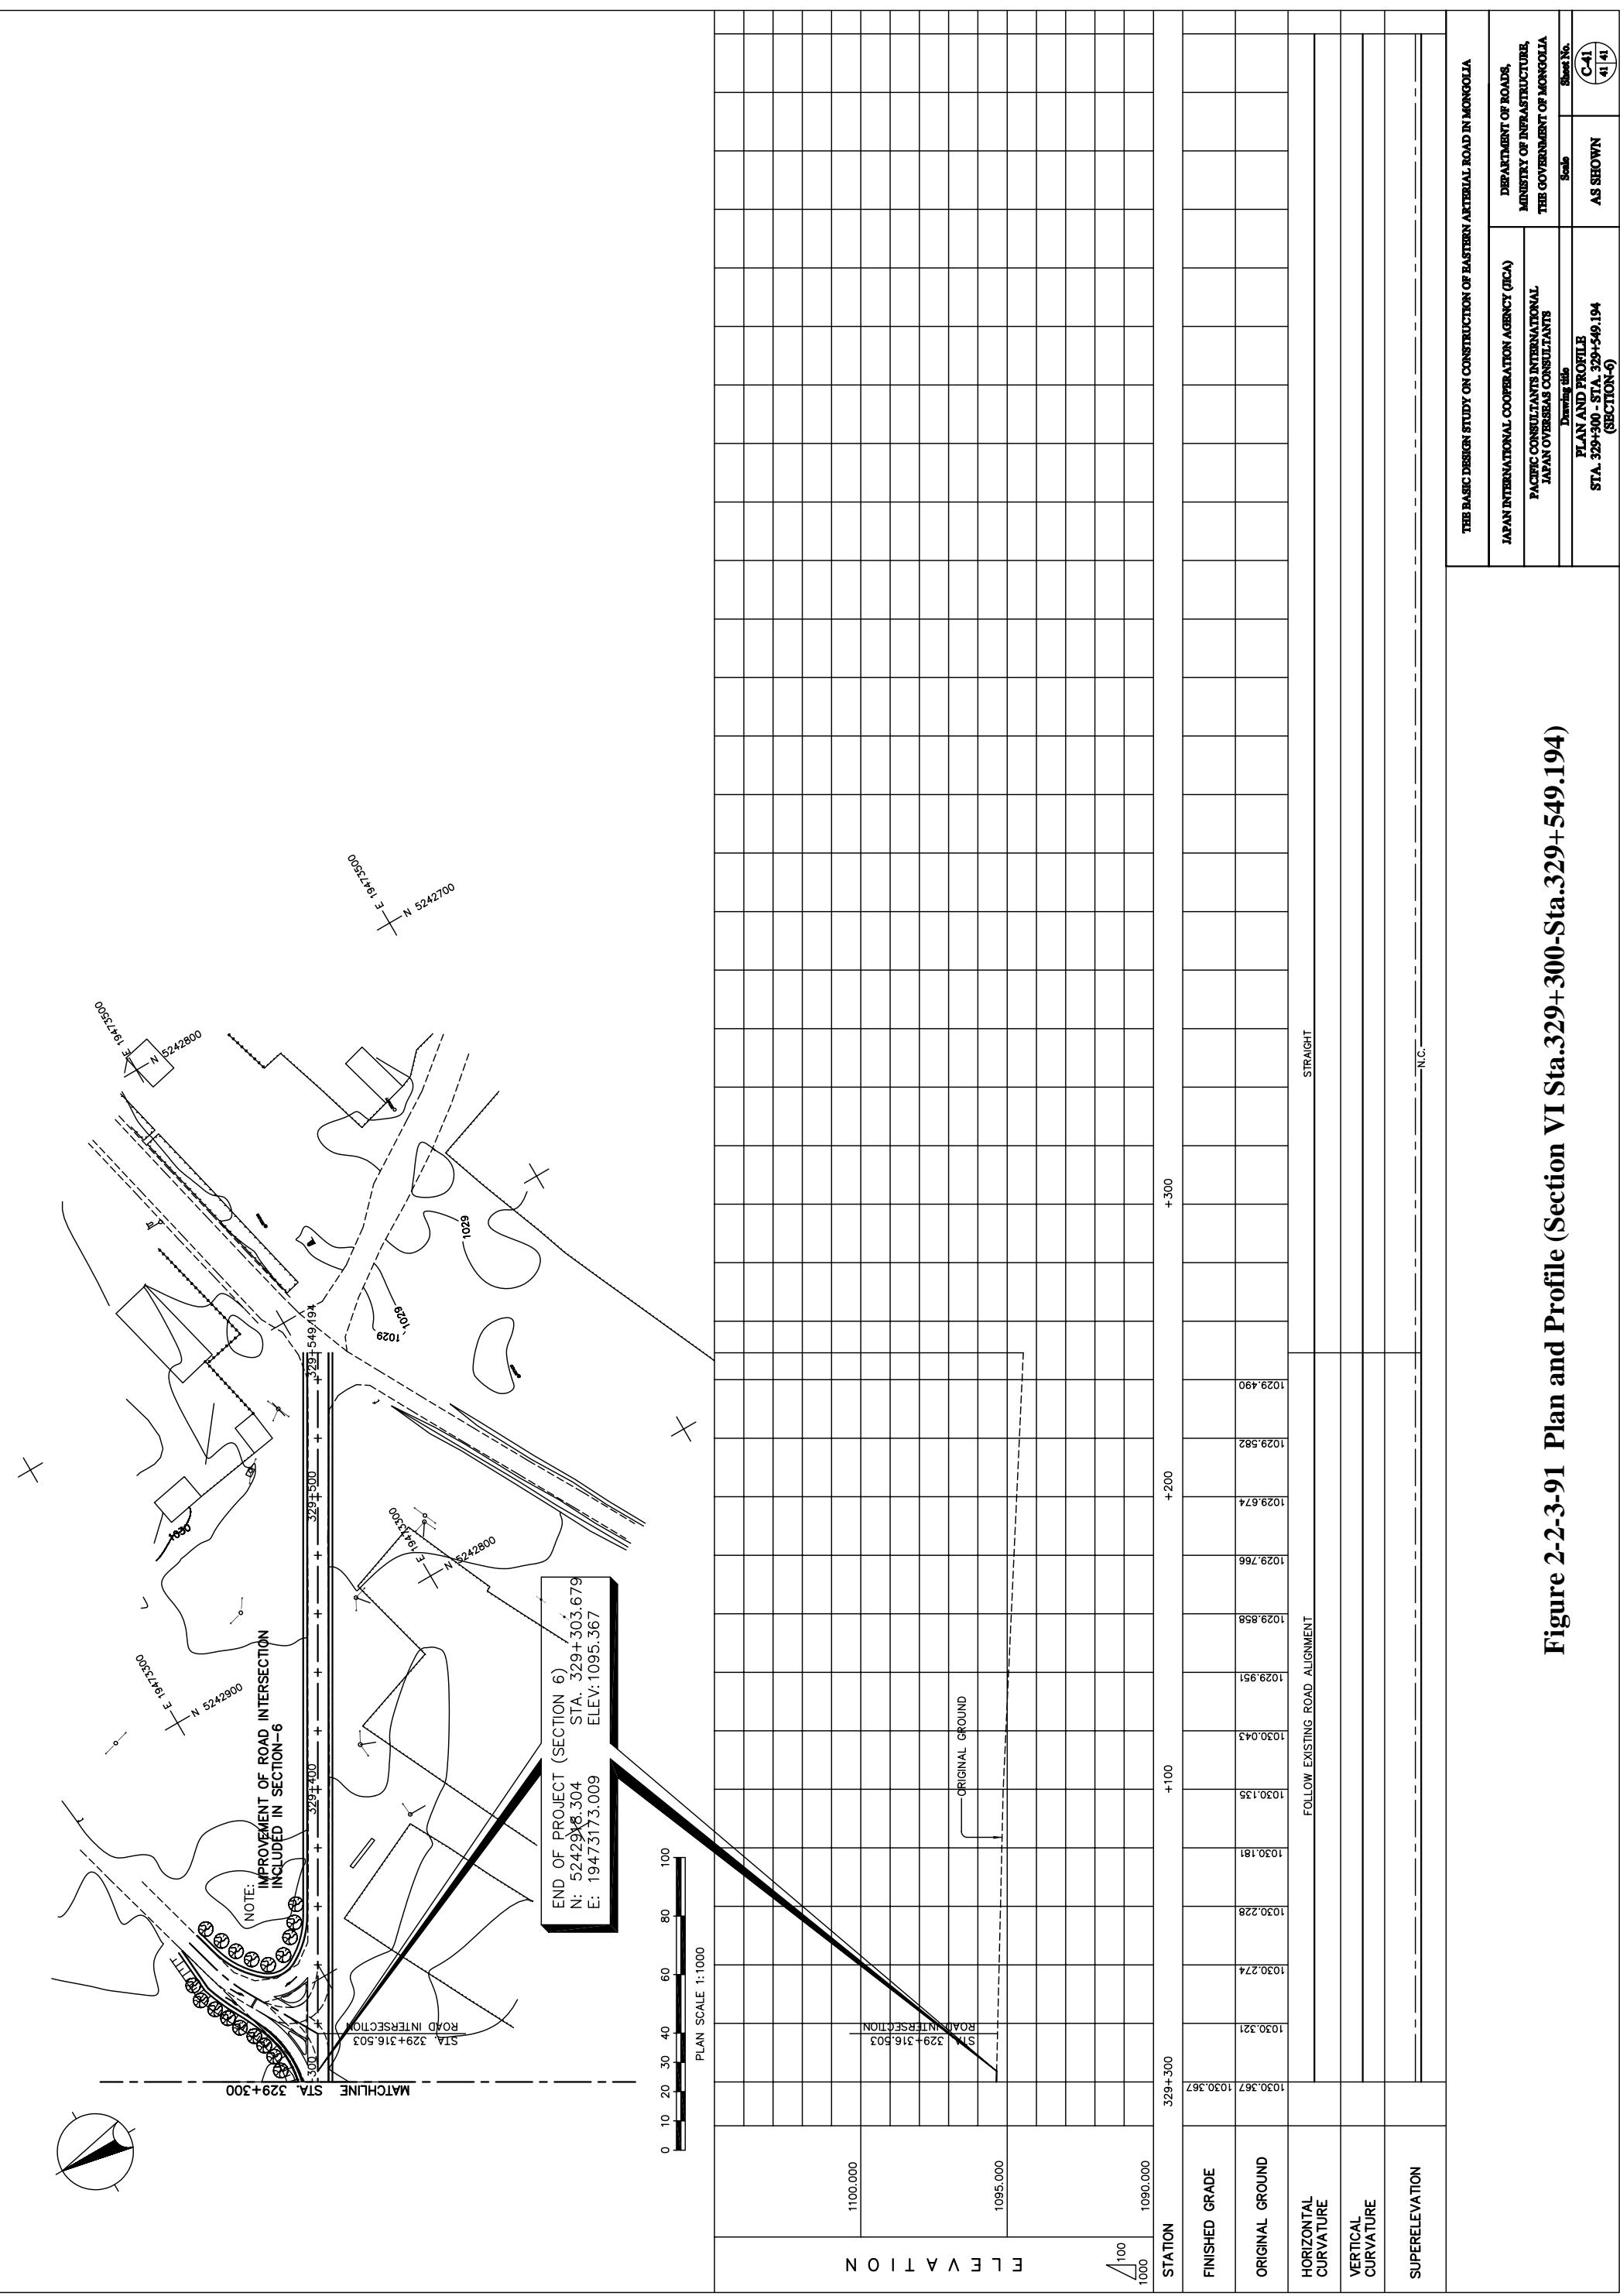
Plan and Profile (Section VI Sta.329+300-Sta.329+549.194)
